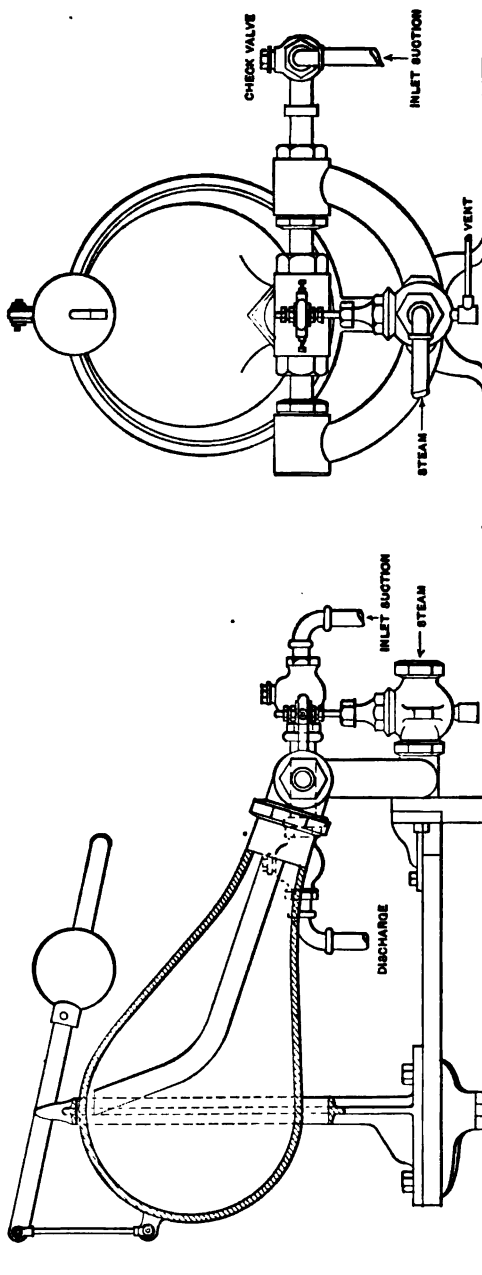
Bundy Return Trap. Must be located above the water-line of boiler.
